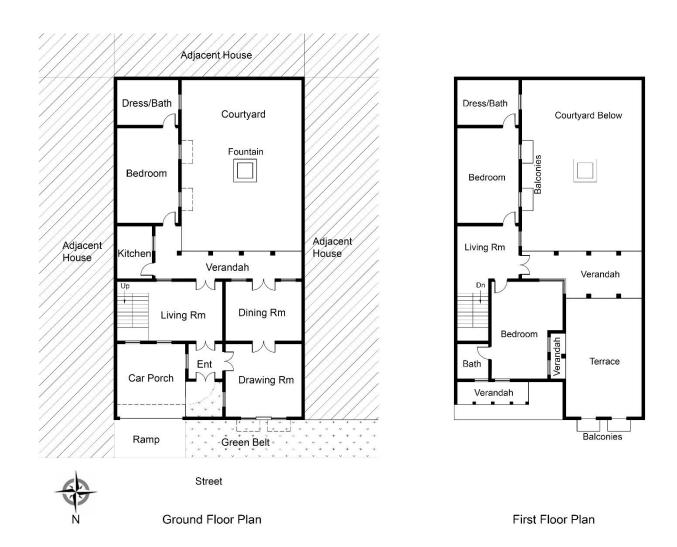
Plans of Proposed Courtyard House (Option A)  $\,$
